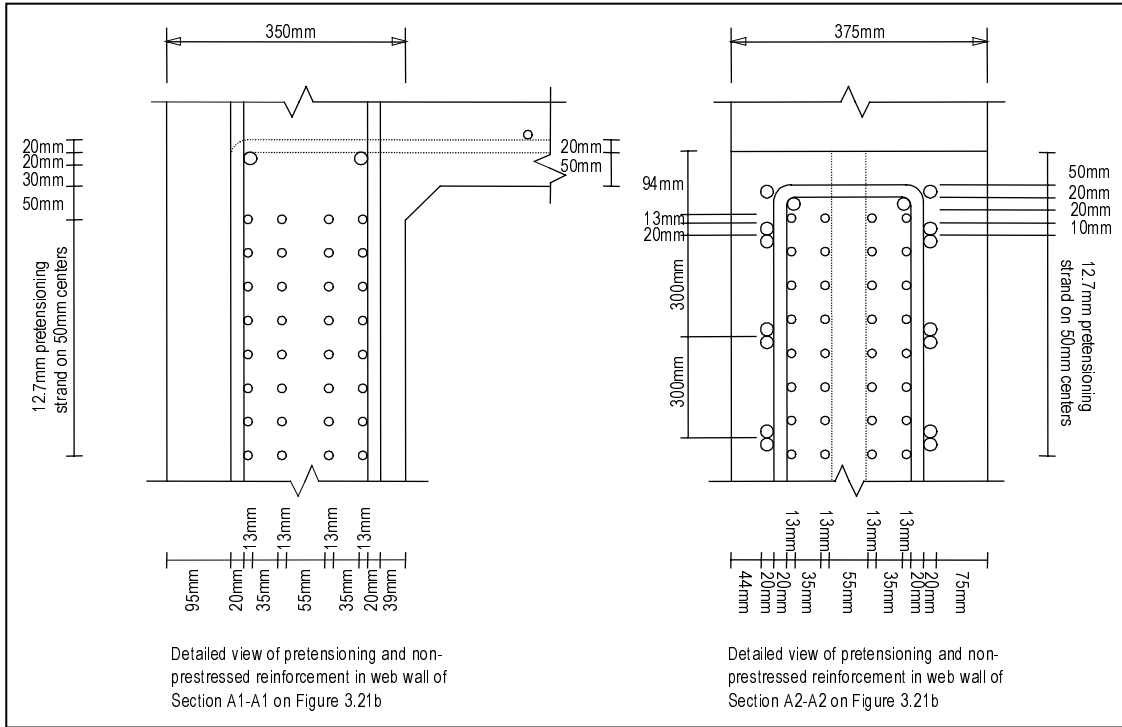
Spacing and cover details for a cap with only pretensioning strand for longitudinal reinforcement
